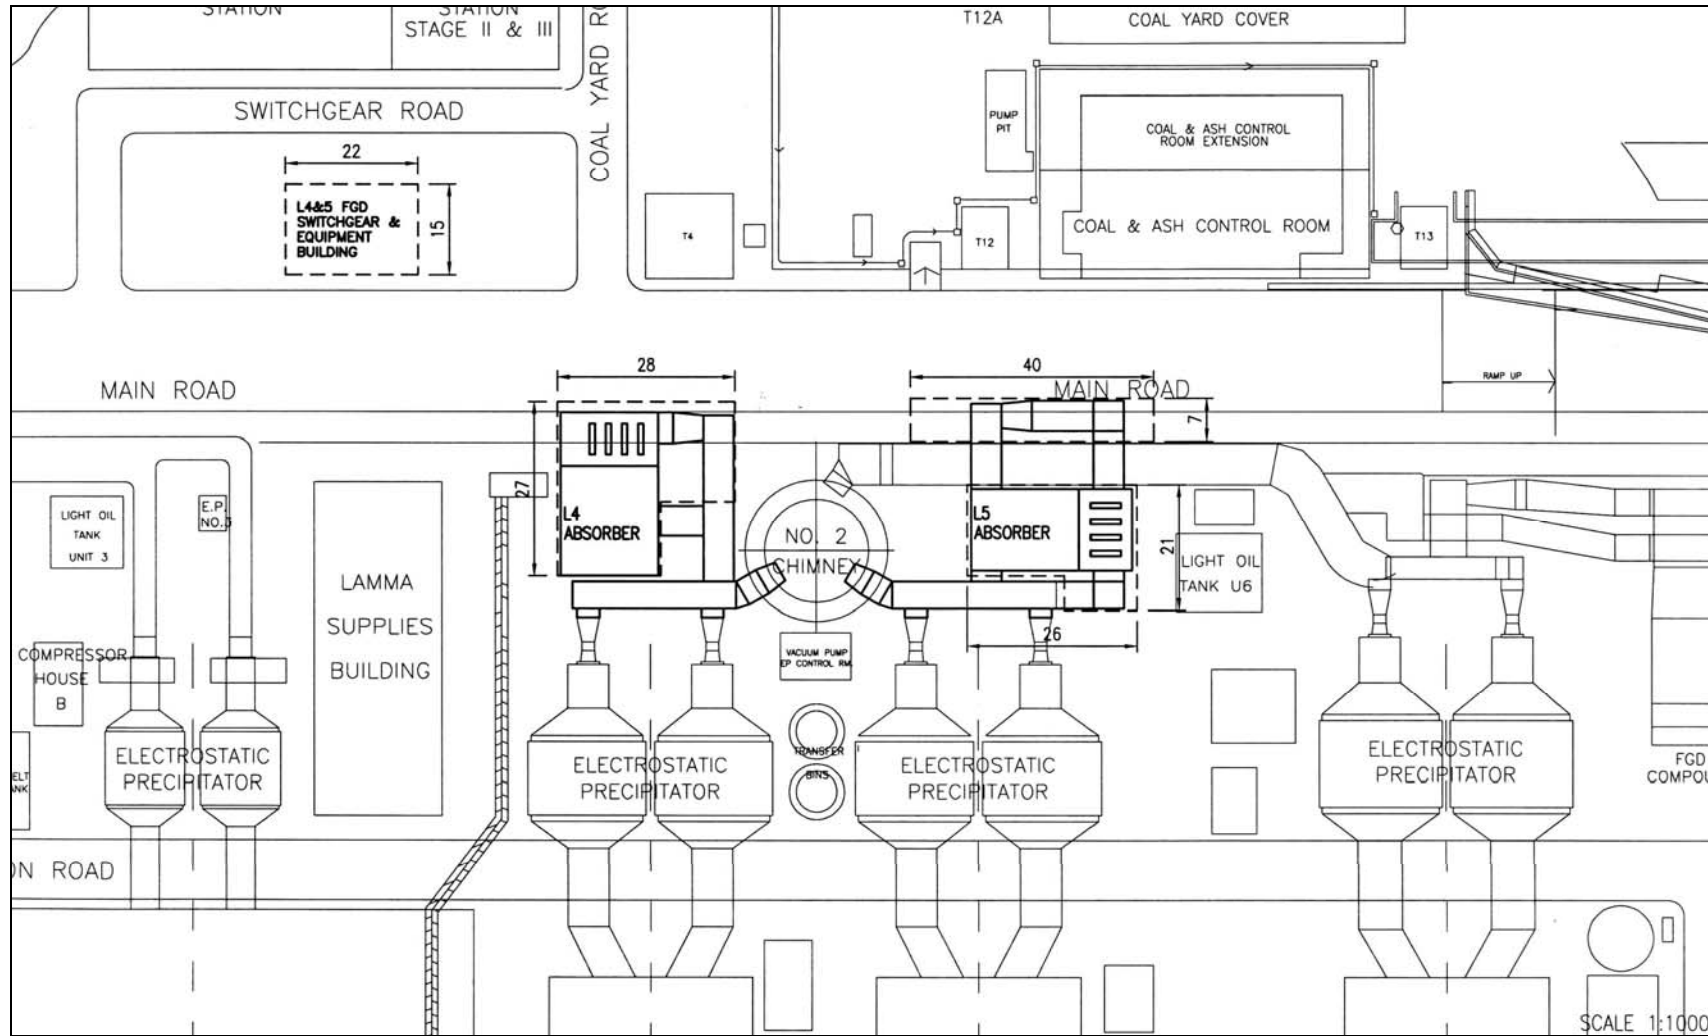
General Arrangement of L4 & L5 FGD Plant
